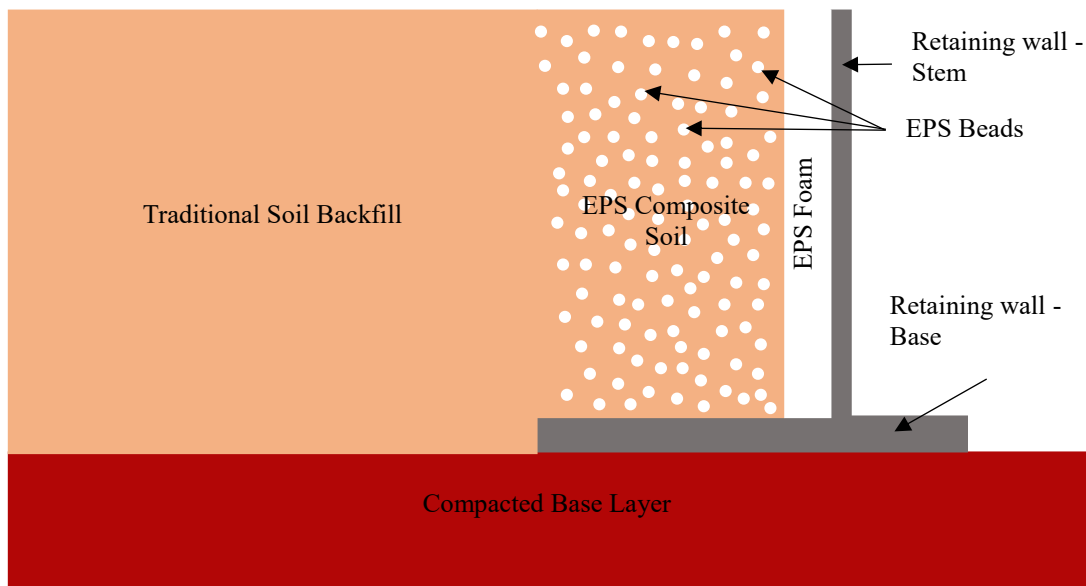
Typical cross section of retaining wall fitted with EPS foam.
